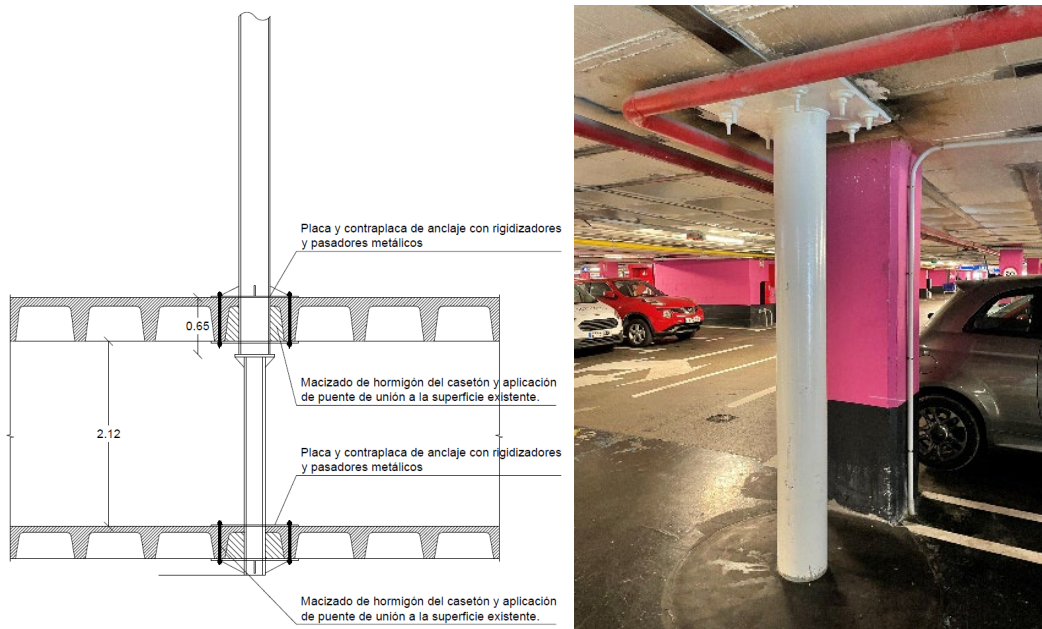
Connection of the masts to the existing structure. On the left detail in section, on the right photo of the connection executed for the embedding in the floor slabs of the existing parking
